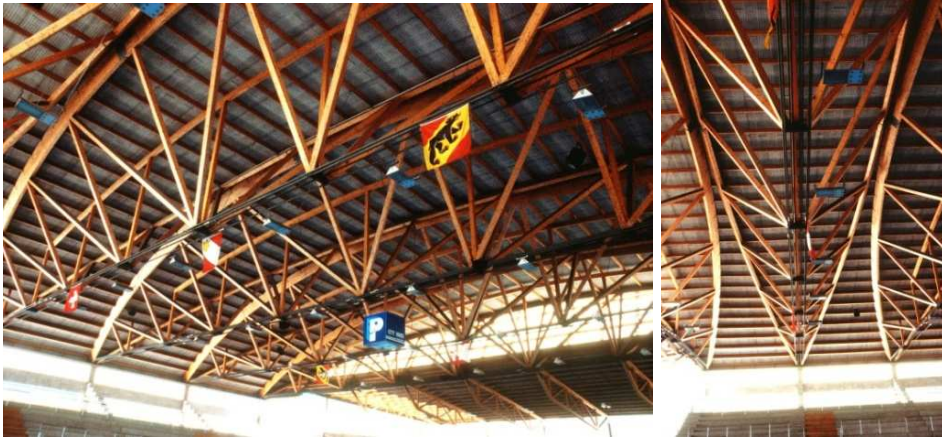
Sport Hall, bowstring of 60m span made of timber and steel rebar (© Jose L Fernandez Cabo).
